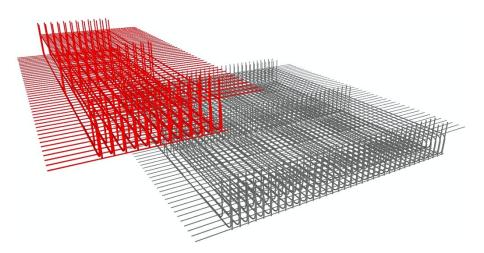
Installation of prefabricated reinforcement cages for the floor (SketchUp).
